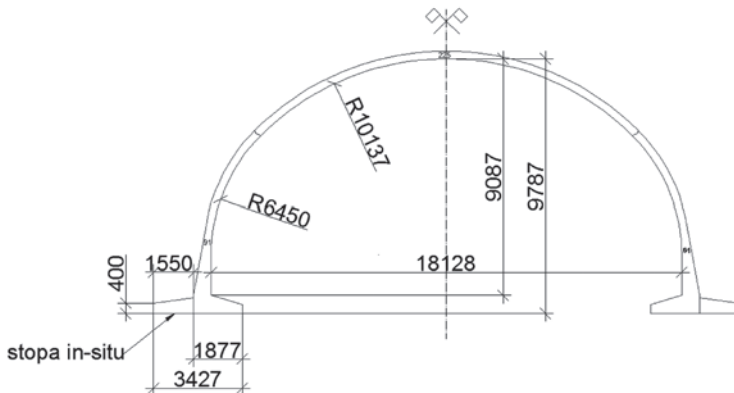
Section of the prefabricated reinforced concrete element of the Matiere system arch
